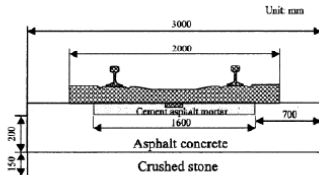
Cross section of the improved solid bed track on asphalt pavement
